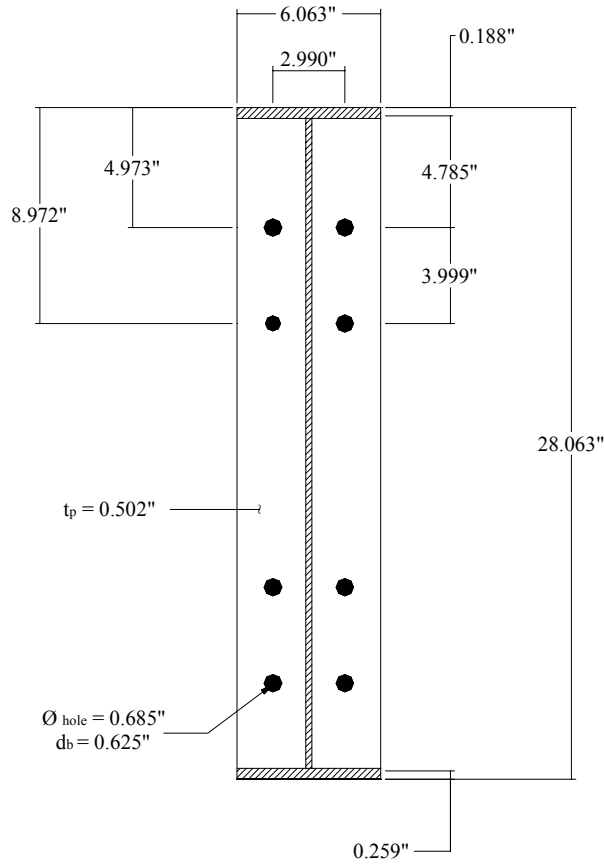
Specimen Nominal Dimensions for Test F2-5/8-1/2-28
